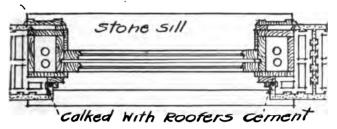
Plan of Hollow Tile Wall with Window Frame and Sash in Place
